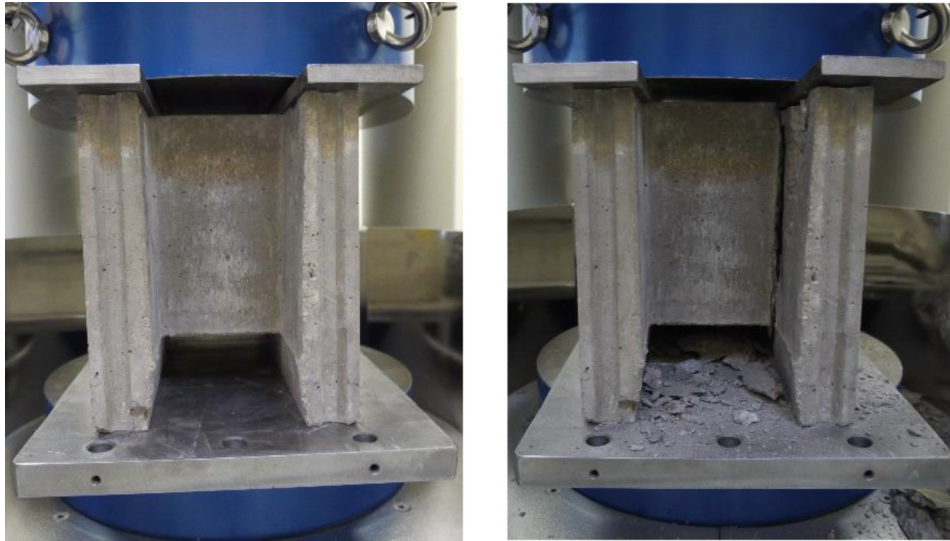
Isolated masonry block before loading (a) and after failure (b).
